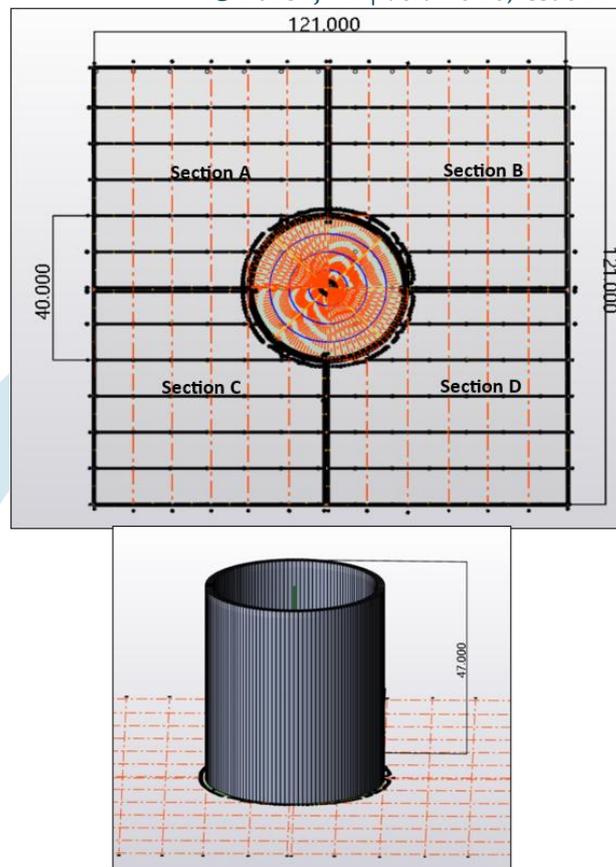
Section Deviation of Nuclear Power Plant and Containment Building Design
